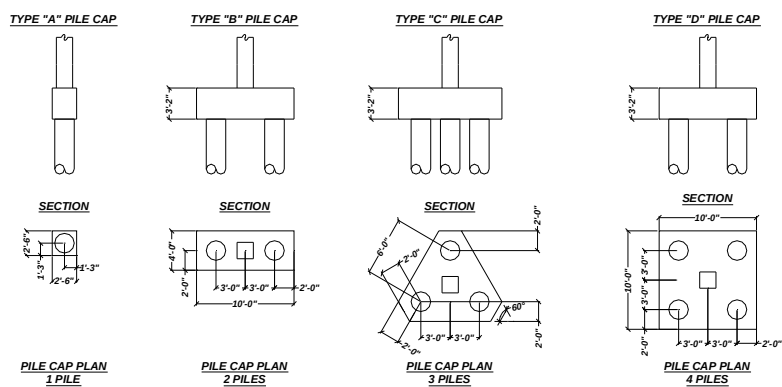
Foundation plan and primary types of (raft) pile-pile-cap combinations.
